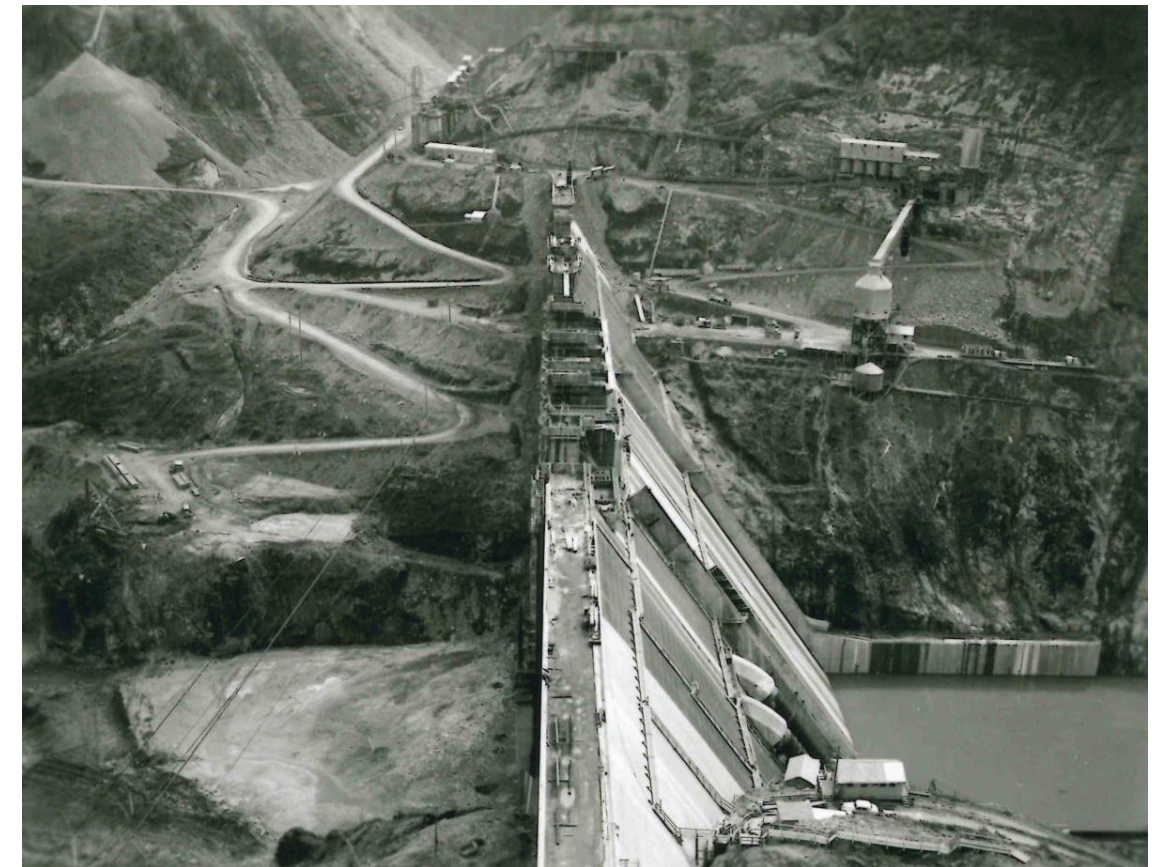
Top view of the Dam, April 16, 1952. Right is the cement mixing plant and rock storage tanks. Left top shows cement storage tanks and supply. Left center shows the warehouse and storage yards. Photo from the US Army Corps of Engineers. WHC #1998.25.49.
